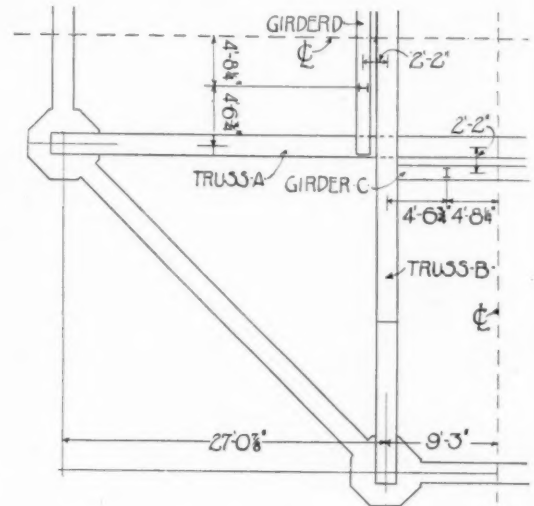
Plan showing the location of trusses A and B, girders C and D and the lantern columns.
